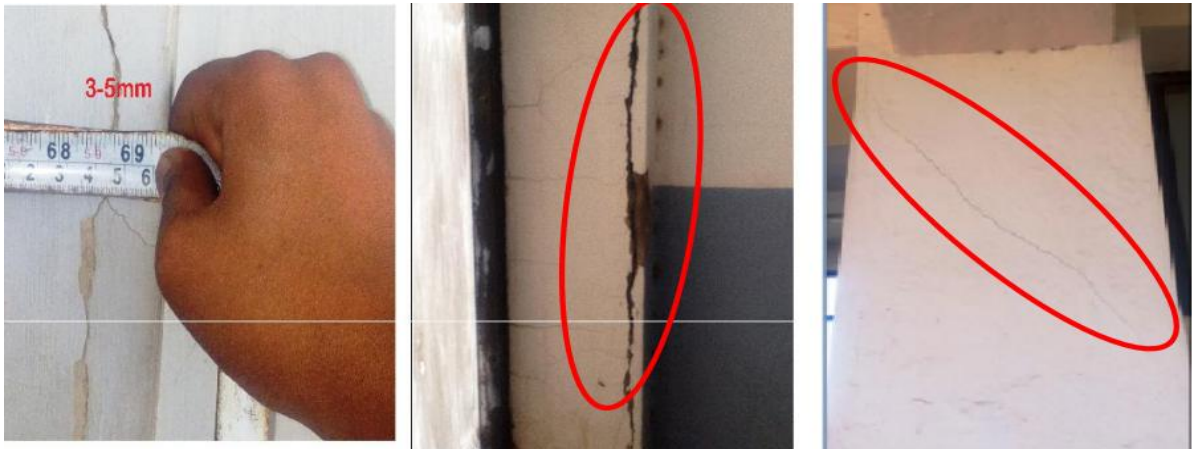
Some hair cracks on axis B and cracks at the edge along the axis C columns
